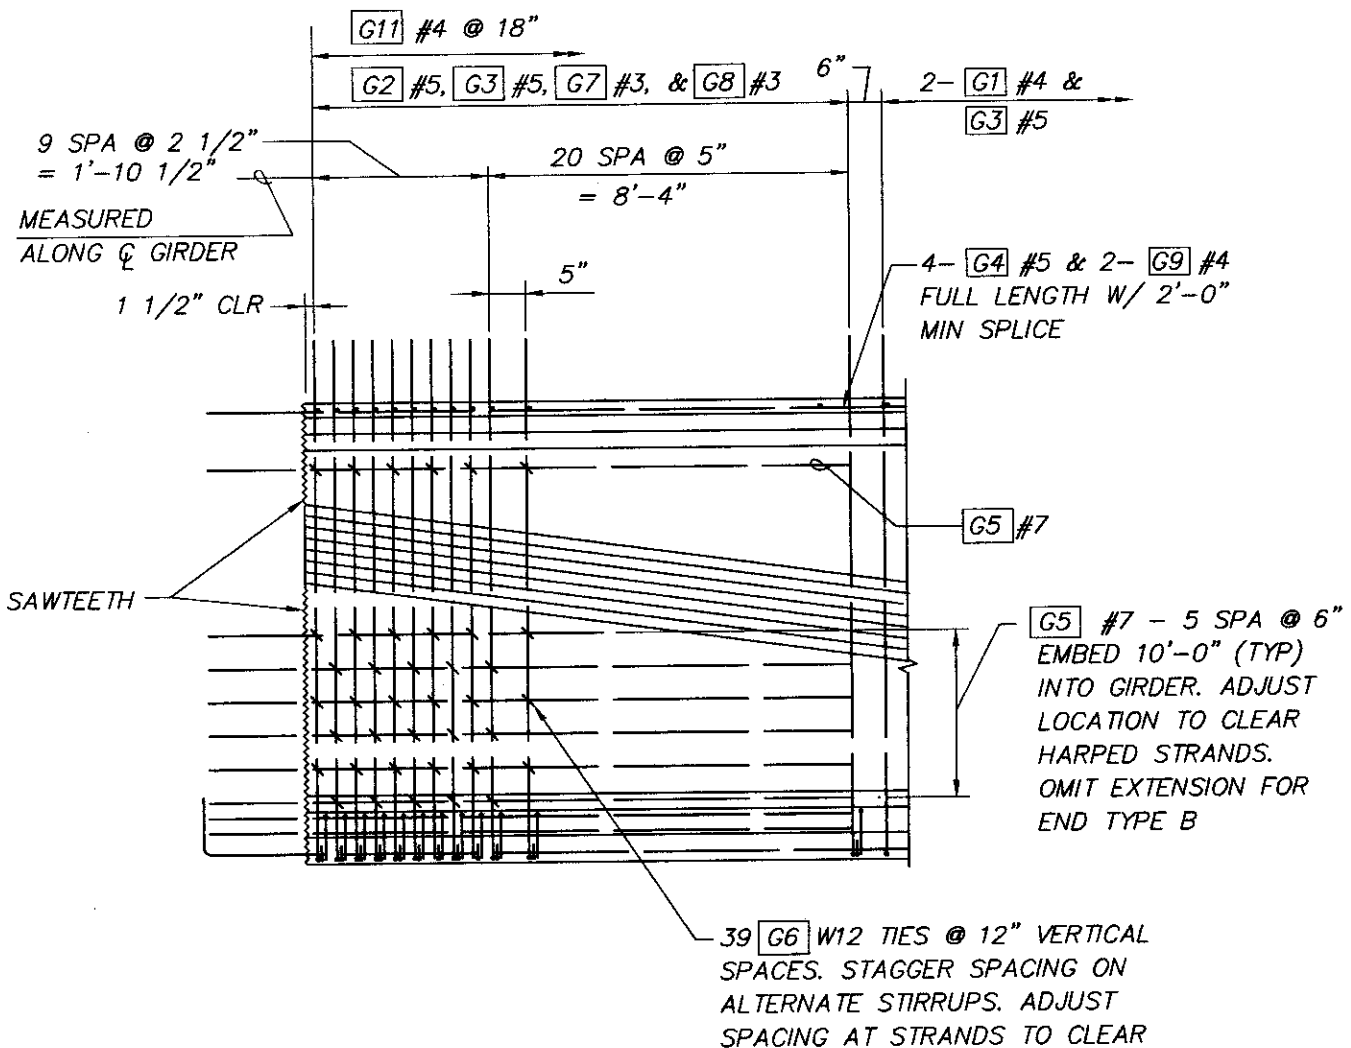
Standard Shear Reinforcement at W83MG Girder End
